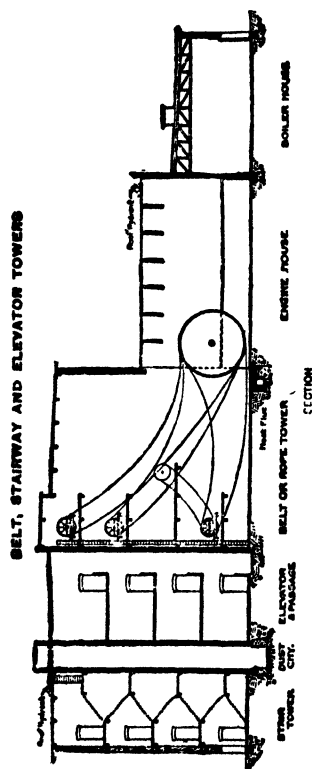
Section through Tower for Elevators, Stairs and Belts
